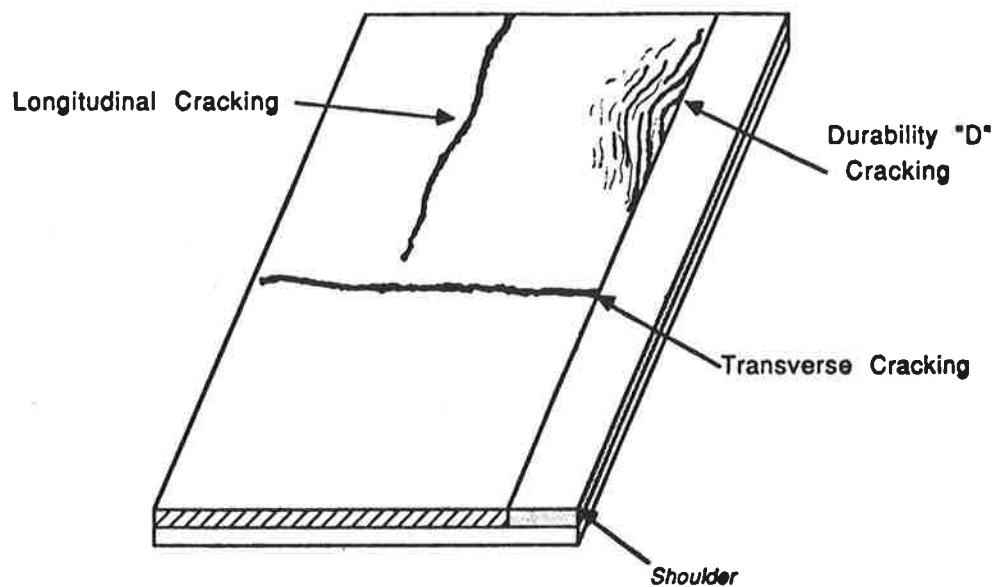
Cracking of continuously reinforced concrete pavement
